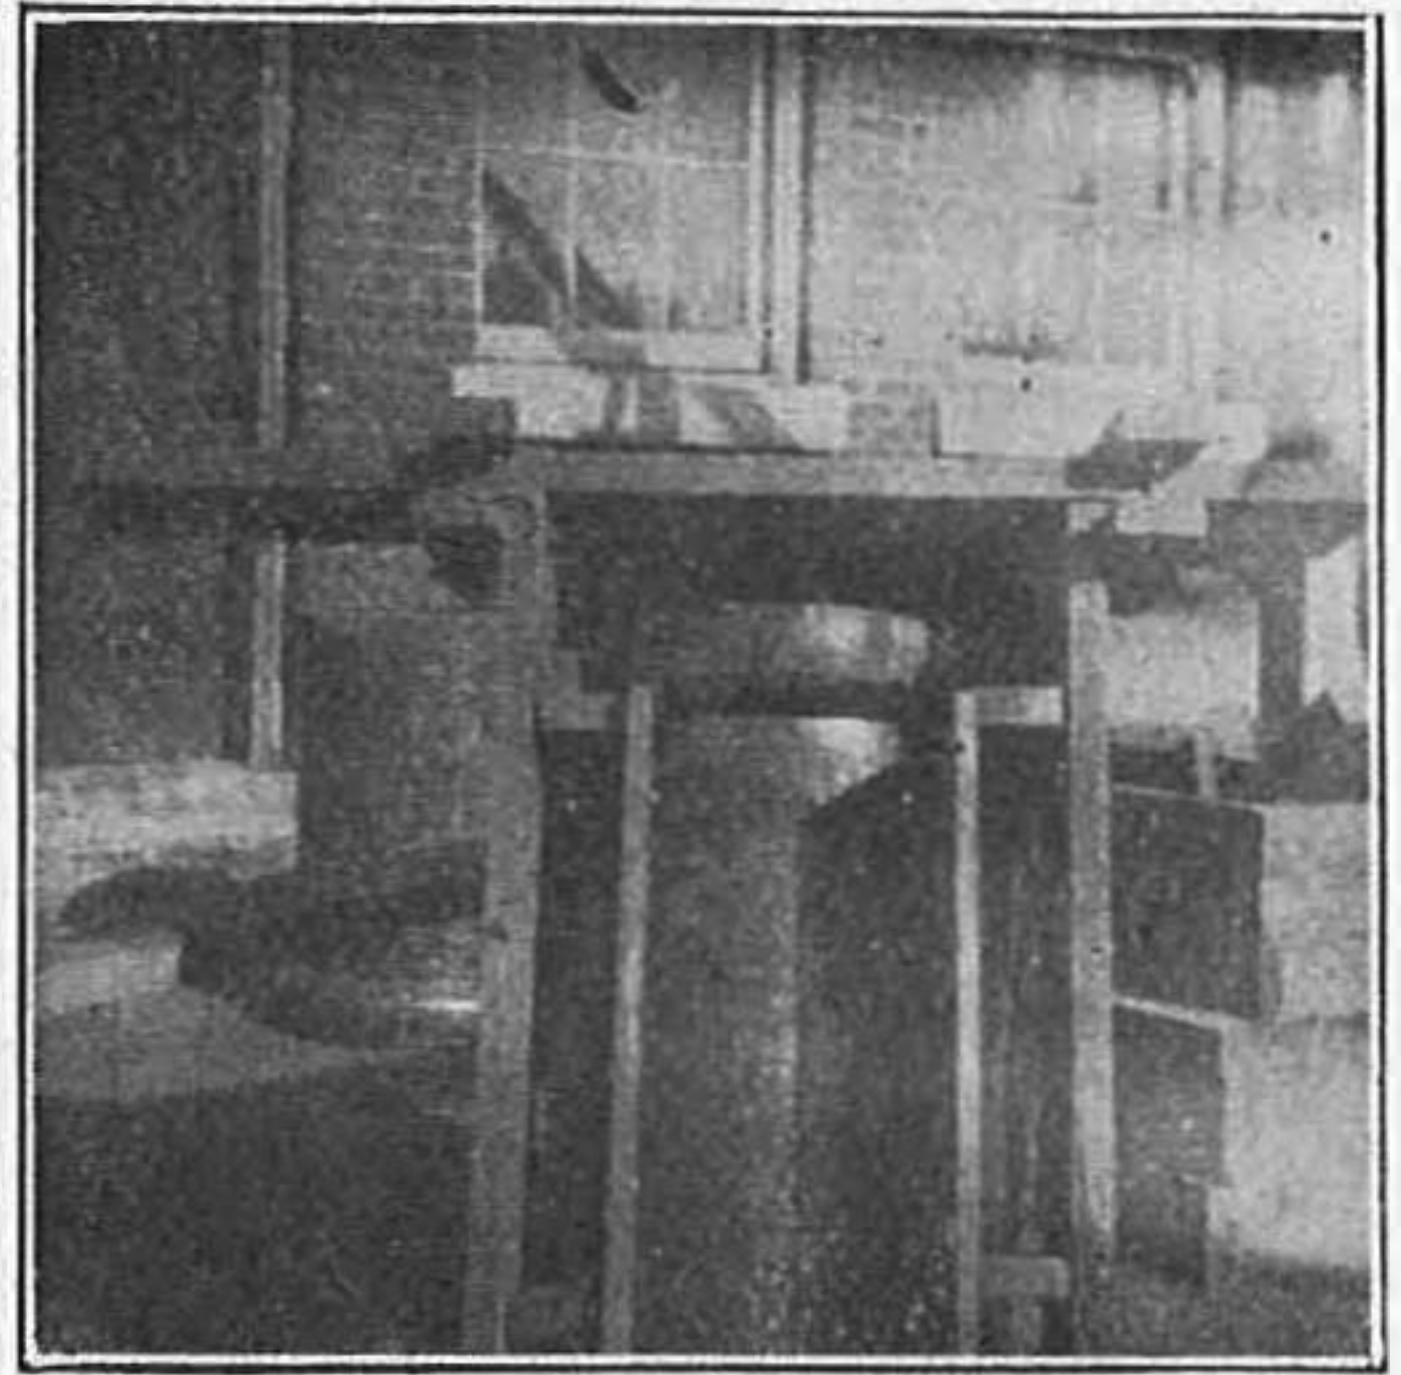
View of Upper Sand Bearing Frame Arranged for Tests of Bell Pipe.
